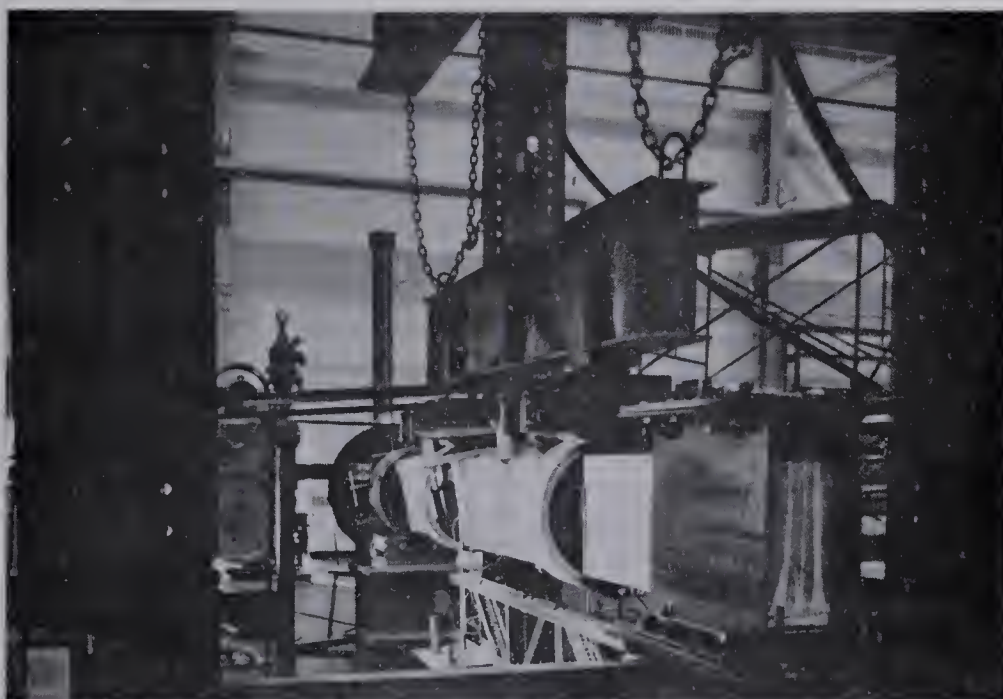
SIDE VIEW OF TEST SETUP FOR COMBINED BENDING AND TORSION
